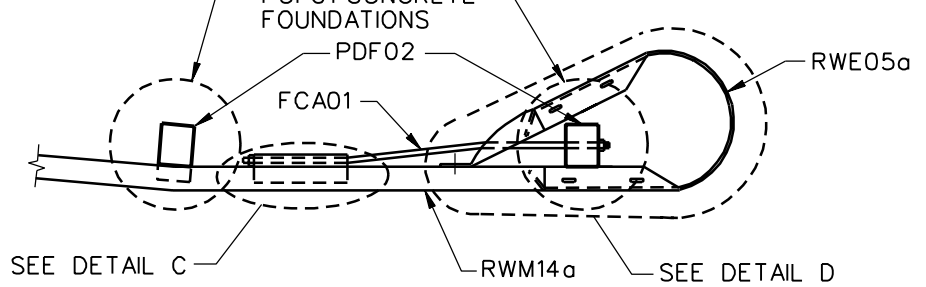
DETAIL A: BUFFERED END & ANCHORAGE-SEW03a
